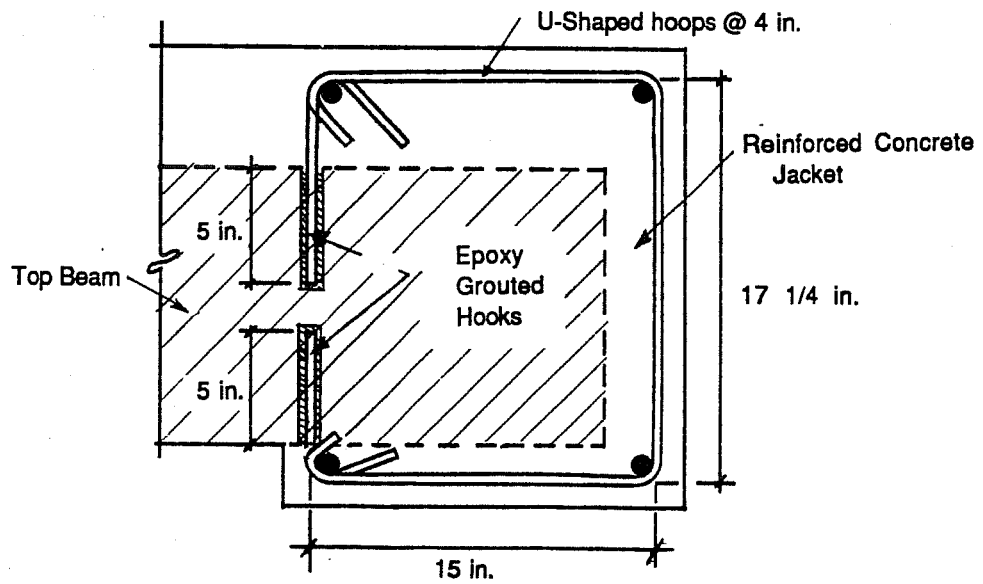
Boundary Element-Transverse Reinforcement in Top Beam Region
